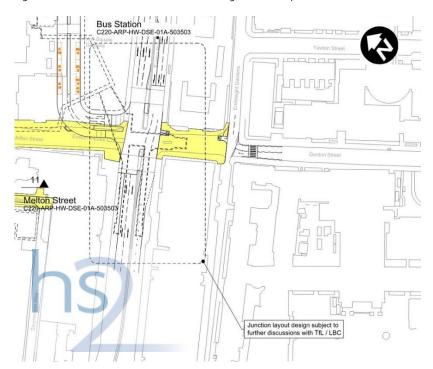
Gordon Street/Gower Place/Endsleigh Gardens layout
